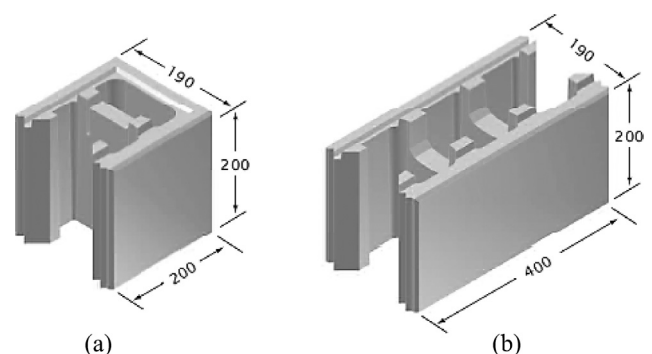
Hollow concrete interlocking blocks (all dimensions are in mm). (a) Half block (b) Full block.
